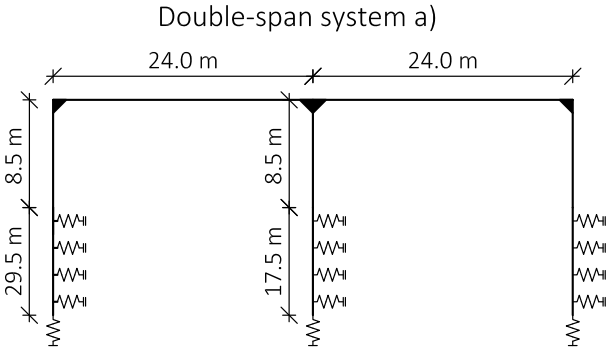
Chosen static systems used for the redesign of the existing A2.Ü22a Overpass
